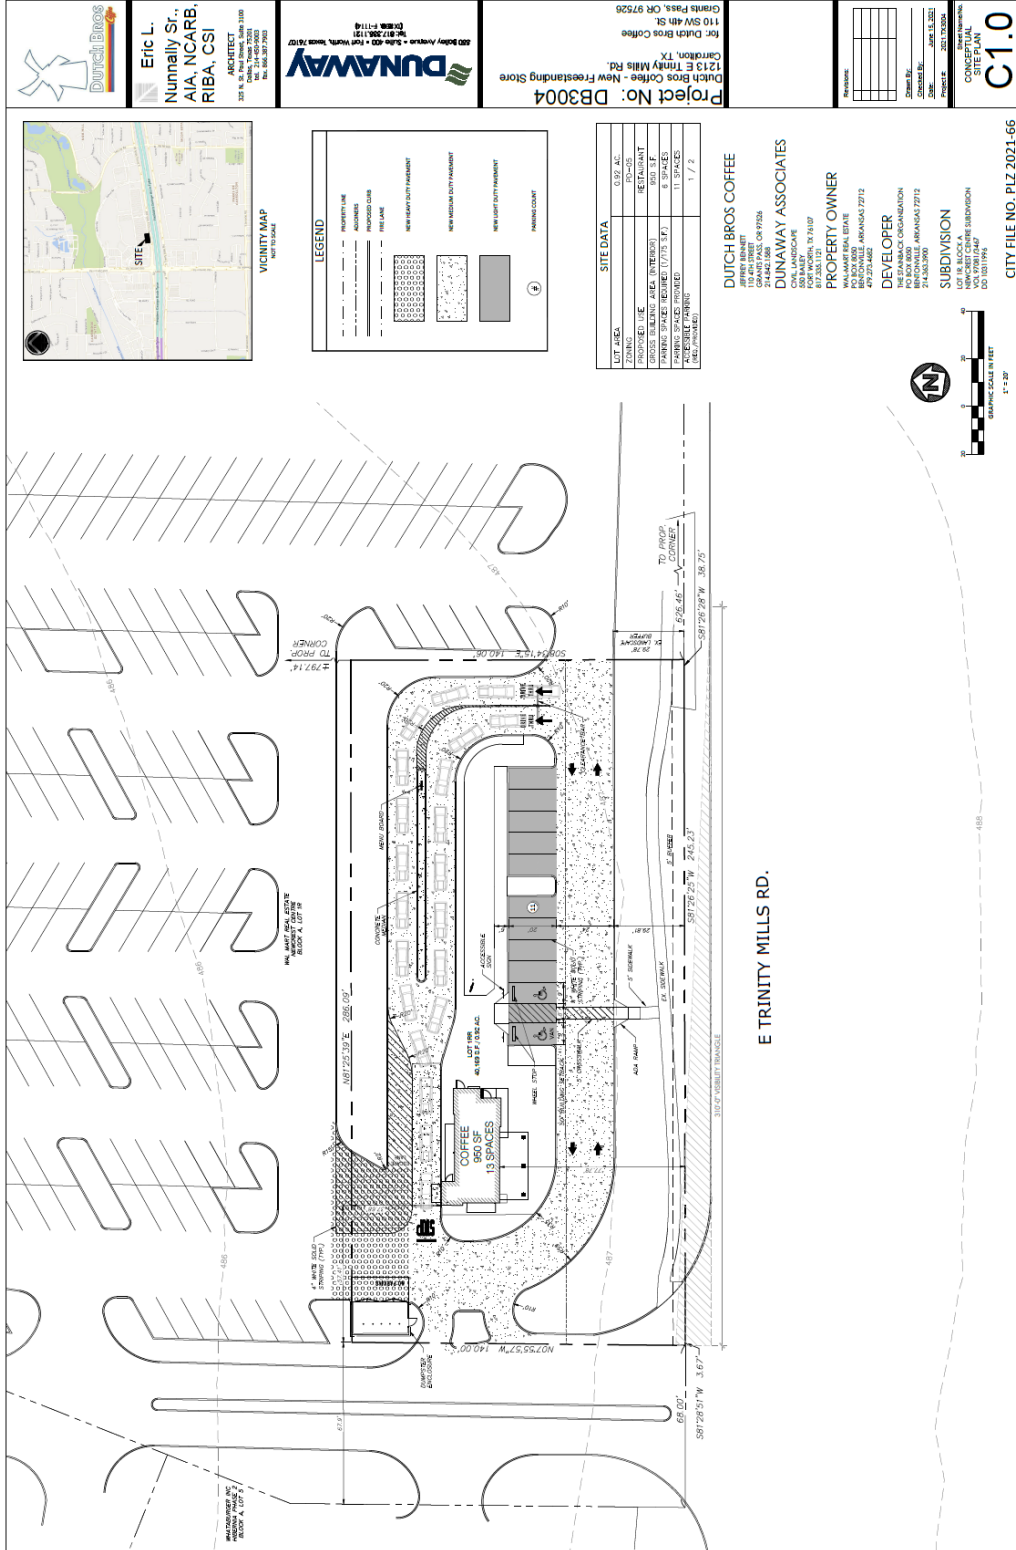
OF 3) CONCEPTUAL SITE PLAN (NEWCREST COFFEE CENTRE)
